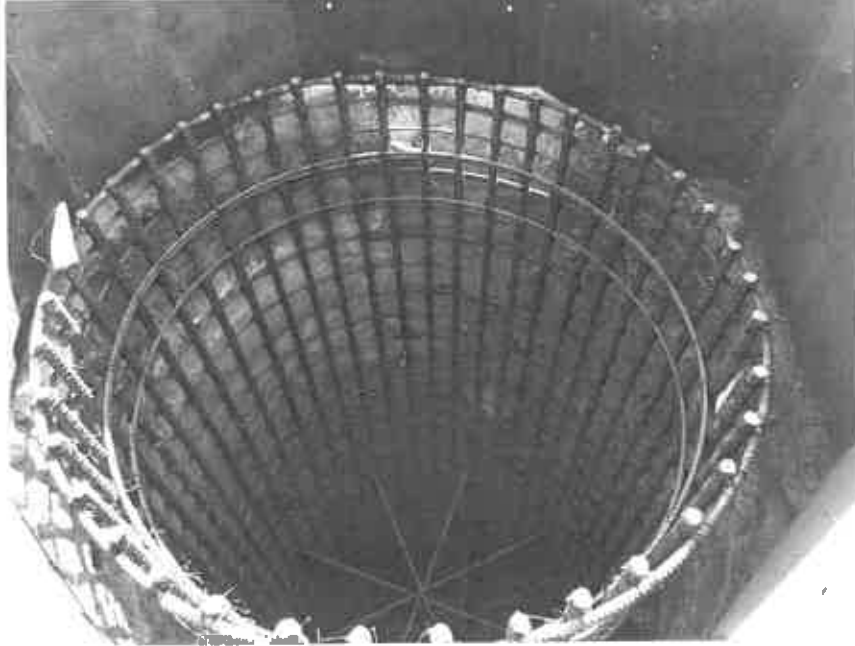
Footing for the SBA cell tower in Bitter Creek
